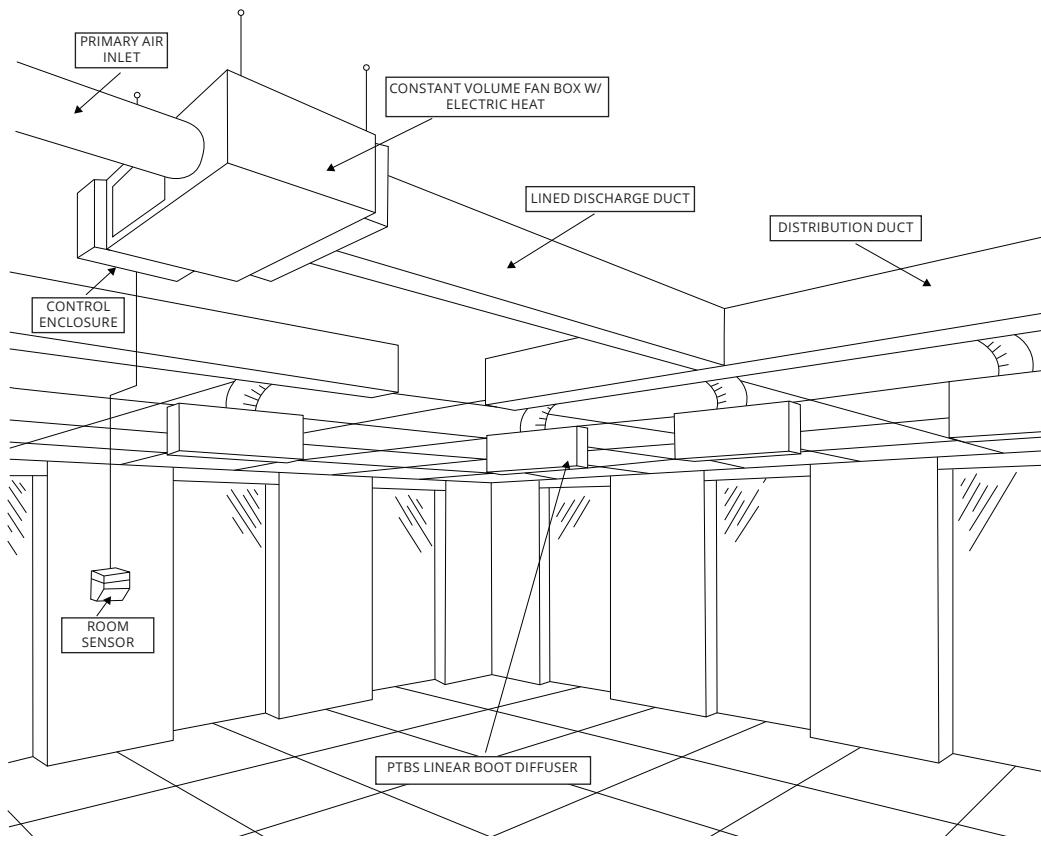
Typical Perimeter Installation – Constant Volume Fan-Powered Box
